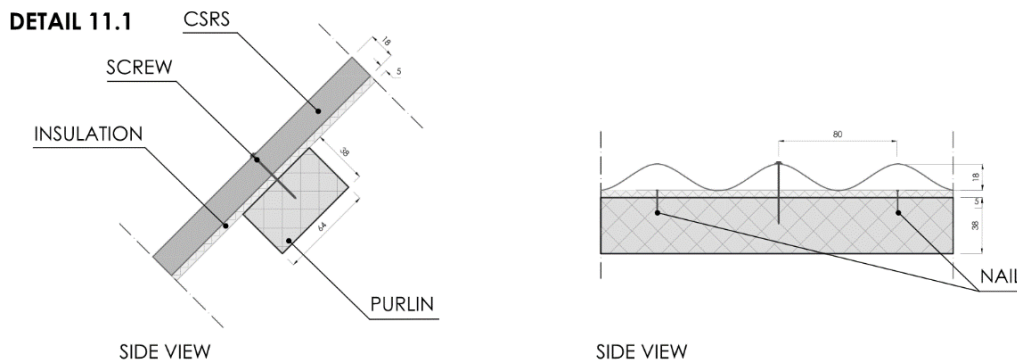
Detail 11.1, attaching insulation and CSRS to purlin
